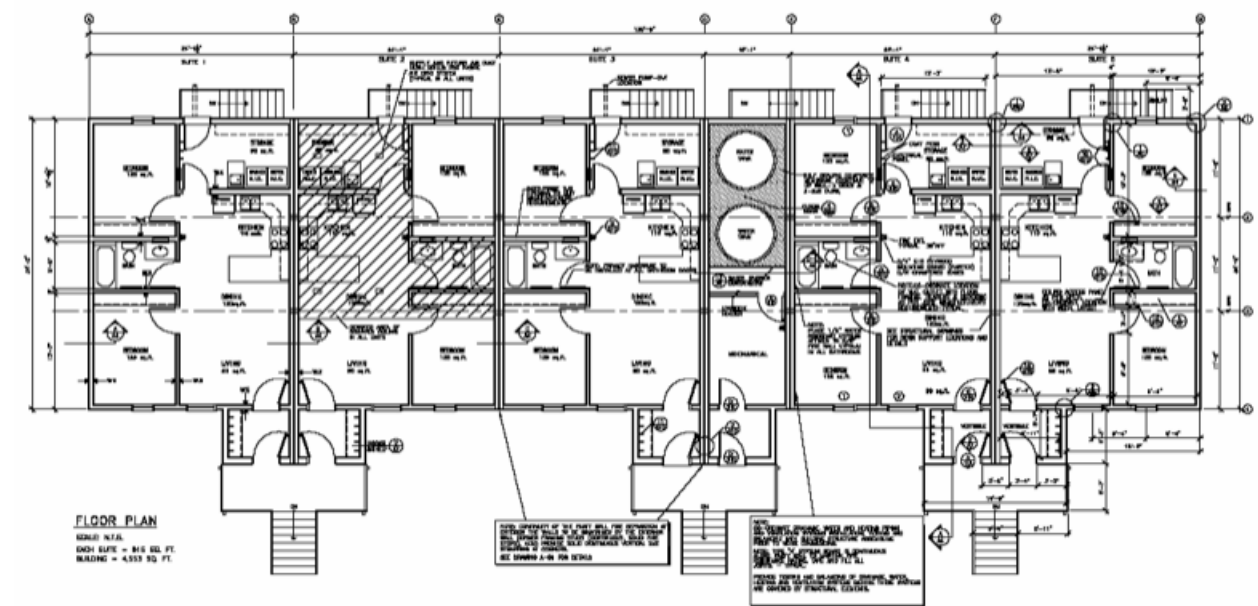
Floor Plan of the Nunavut Five Plex (Semple, 2008)
